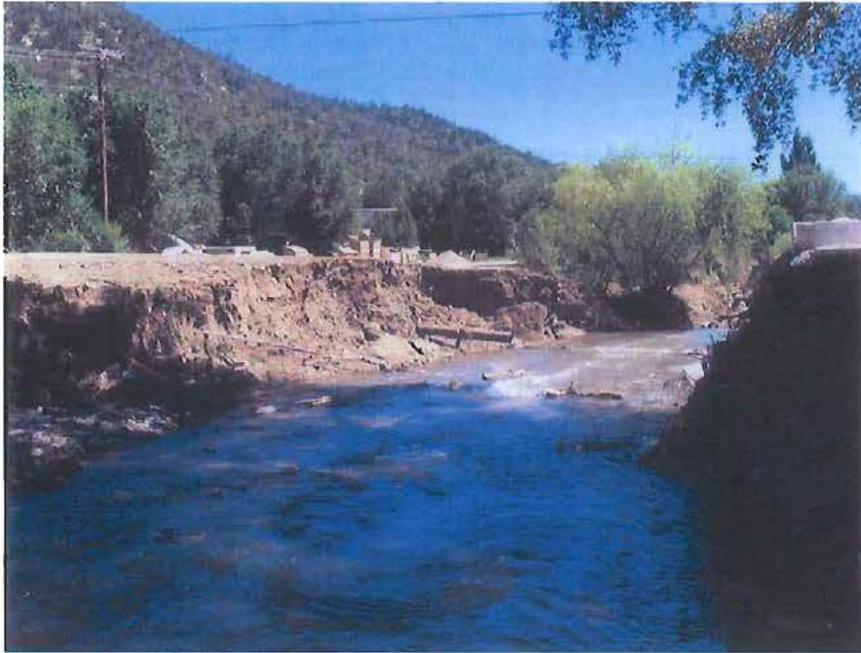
Looking downstream. Note brown pipe at left center of photo. The pipe is the center line of the destroyed structure.
